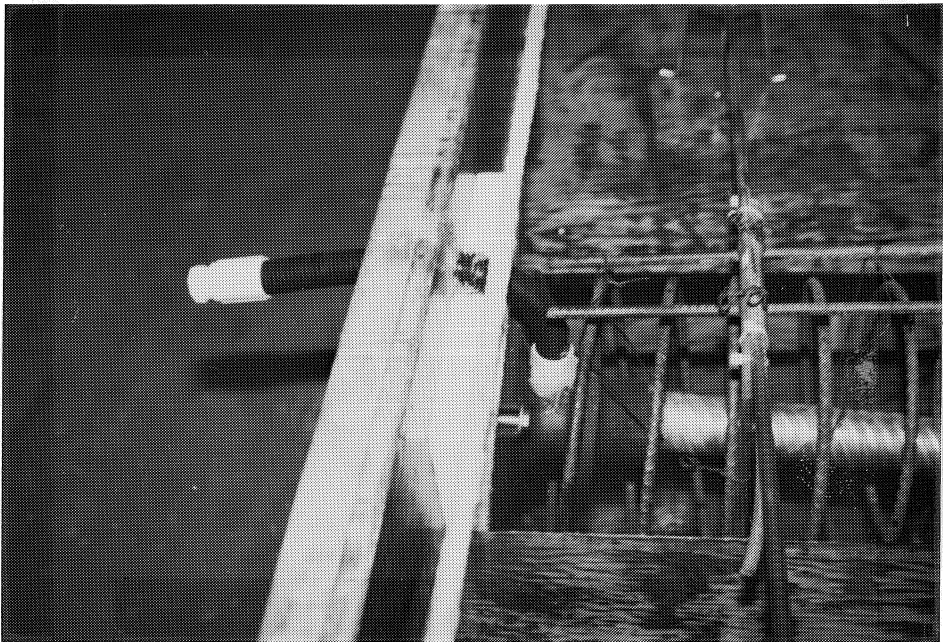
Embedded Anchorage Plate and Spiral Reinforcement in Place Before Casting
